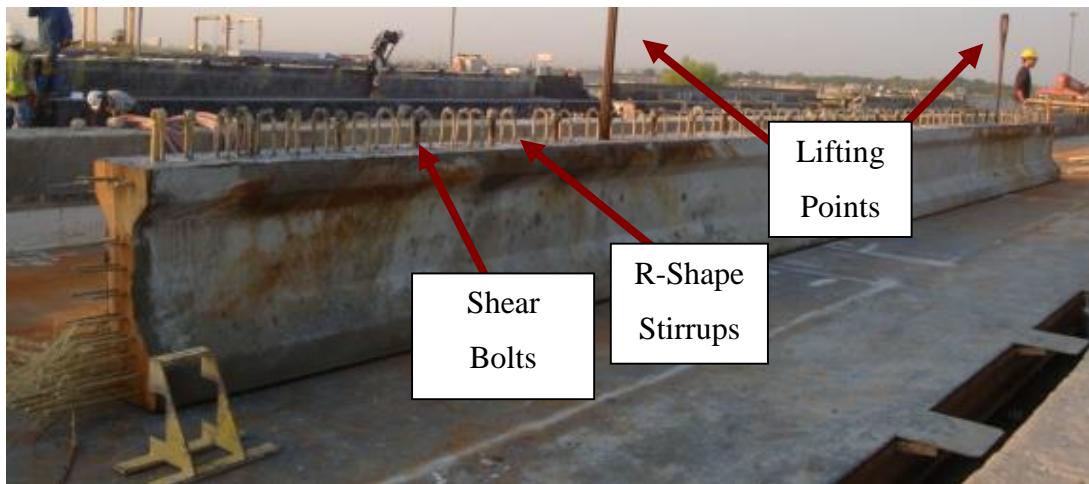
AFRP Reinforced AASHTO Type-I Bridge Girder.
